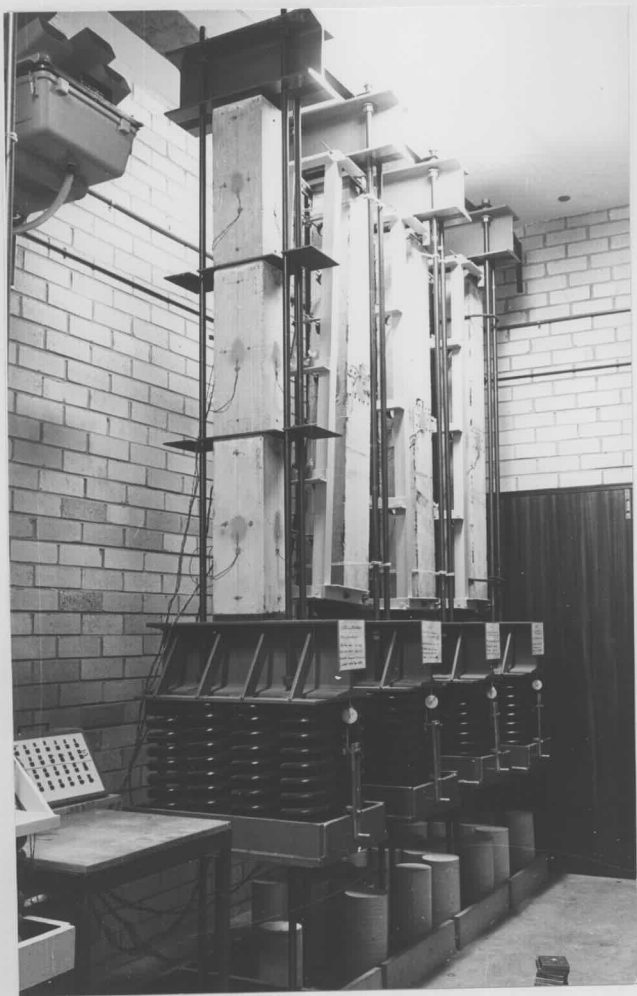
PLATE XLIII CREEP SPECIMENS FOR COLUMNS
